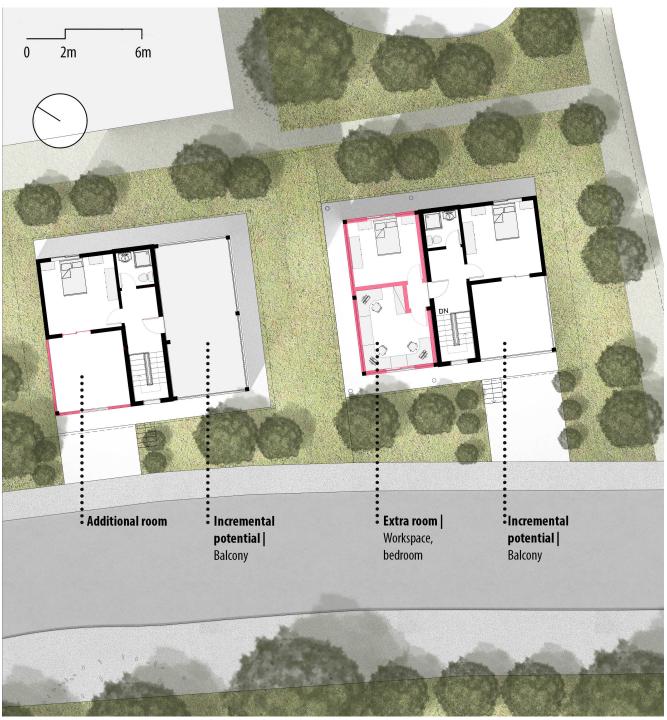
Second floor plan of single-family housing type on Site 01 in the expansion scenario.
